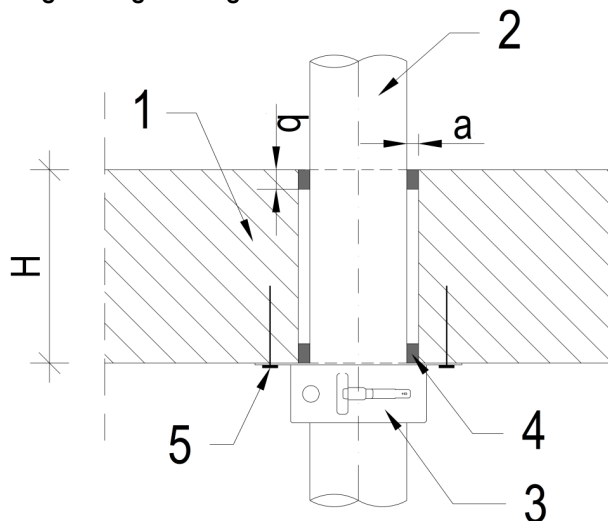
Transition in a flexible/rigid wall $A \geq 100$ mm
